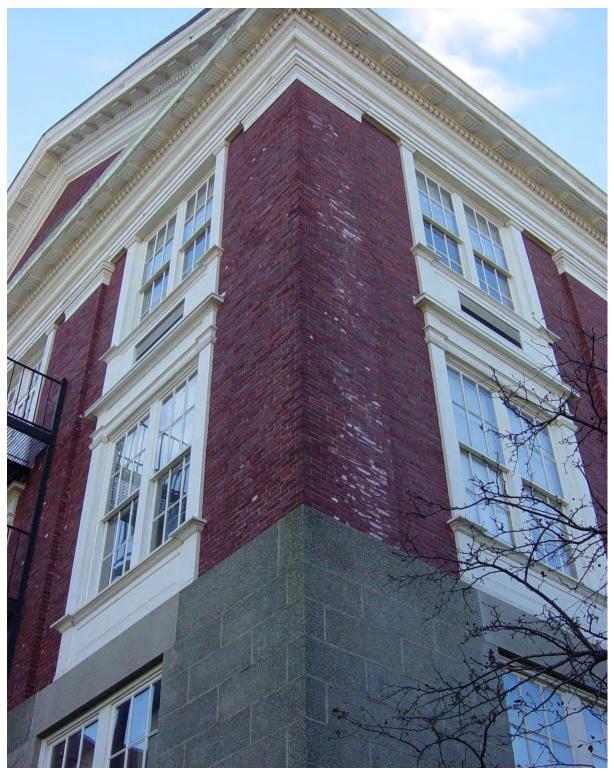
Brick walls, granite base and building mortar are in good condition. No settling or cracking of masonry was seen. Due to weather, the northwest corner of building showed the most deterioration to the
